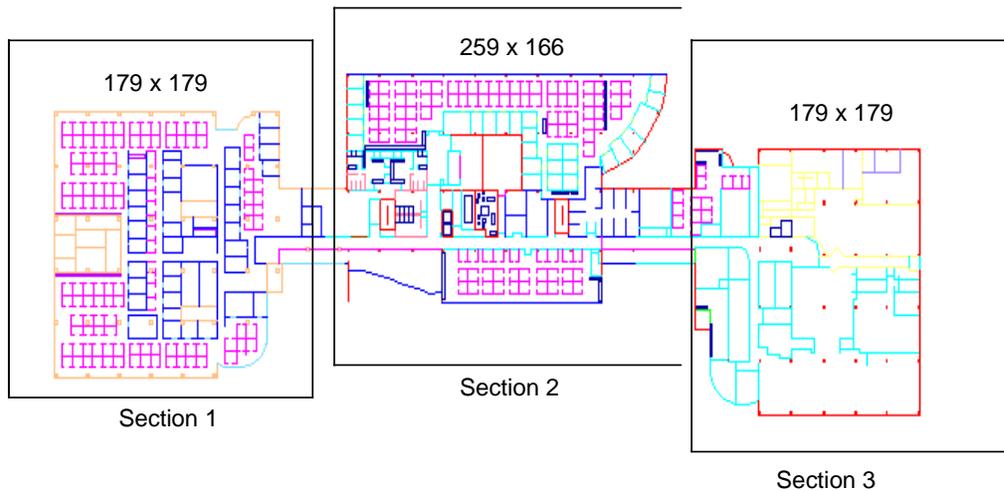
Total Floor Plan Layout for the Mt. Airy Office
